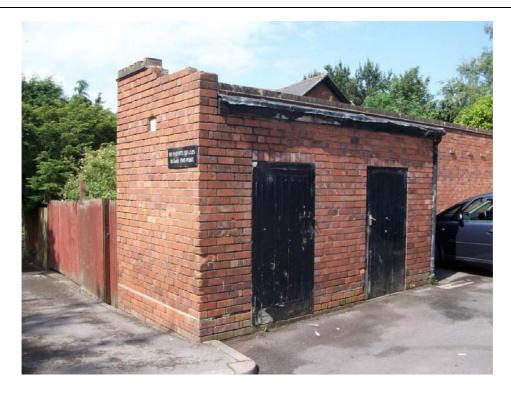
, Outbuilding to south-east end of former cycle sheds, view west
